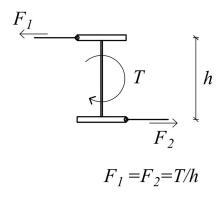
Torsional bracing of an I-girder as achieved by means of two translational bracings, i.e. by the force couples F_1 and F_2 . It is assumed that the bracings can take both tension and compression.
